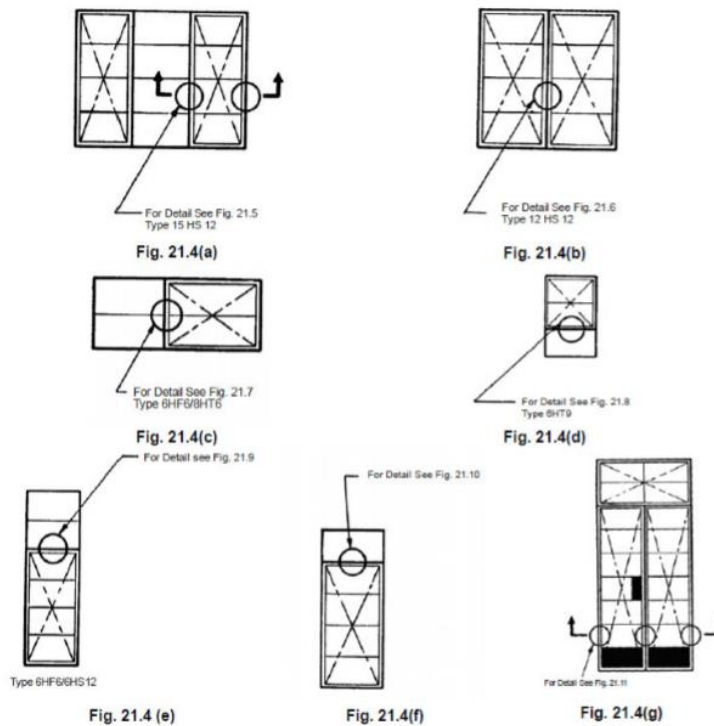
Location of Parts of Aluminium Doors, Windows and Ventilators for which Details are Shown
